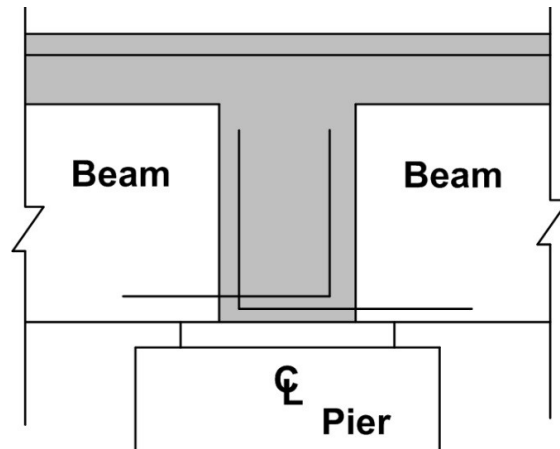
Continuous Prestressed I-beam Schematic
